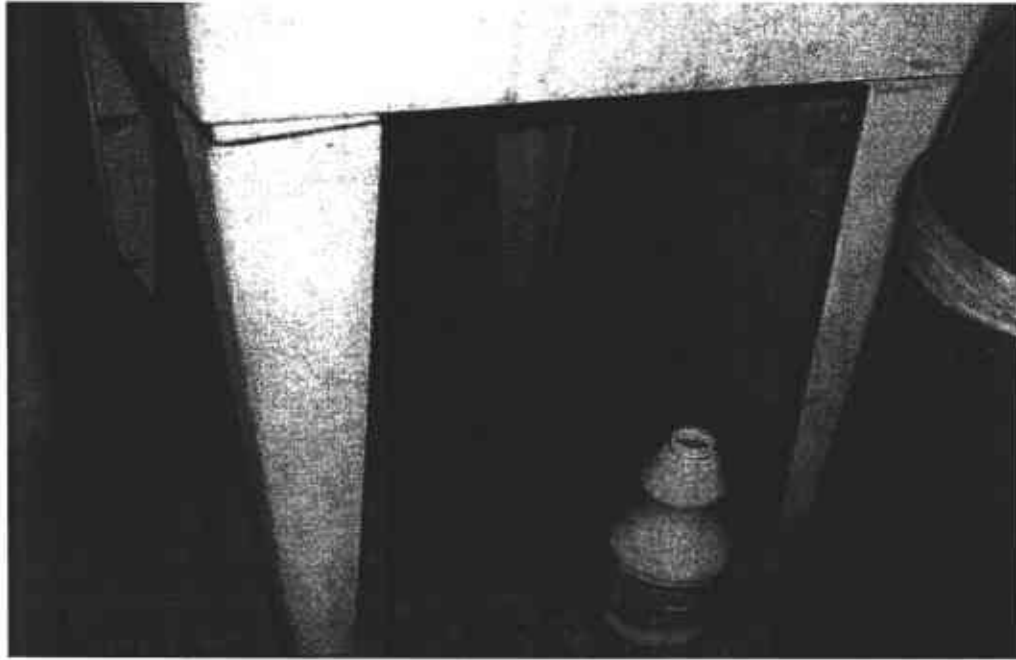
View looking at a floor drain in the interior of the subject property building.
